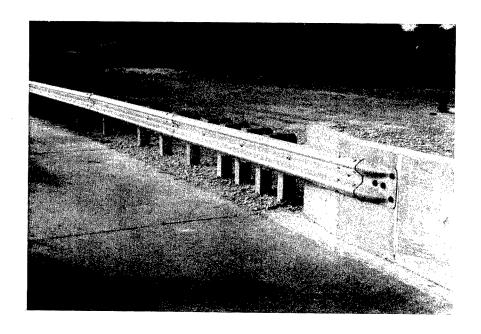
W-beam transition (on steel posts with timber blockouts) before test 405491-2.
